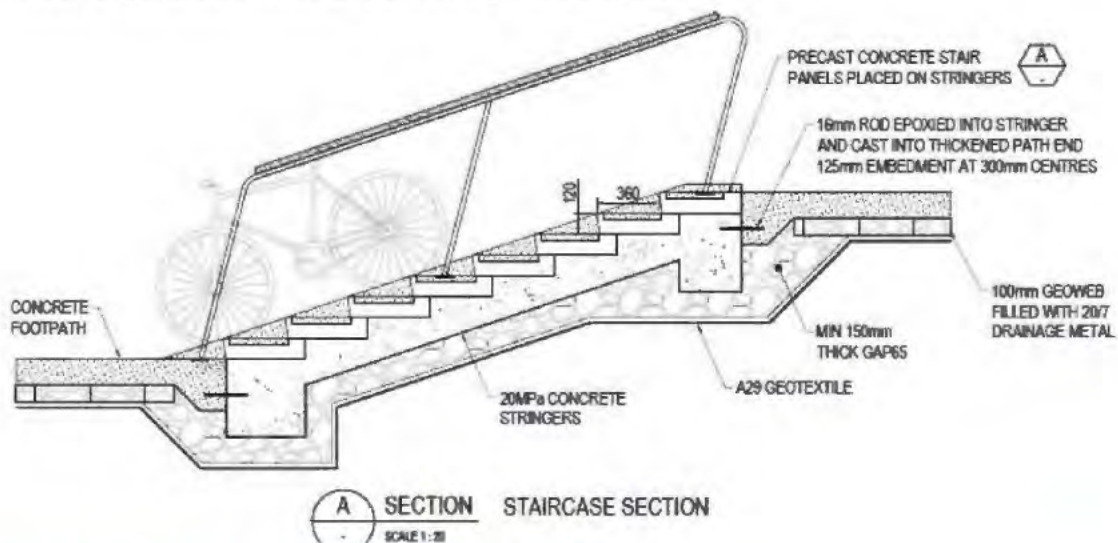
Staircase detail from Awakeri Wetlands Stage 1
